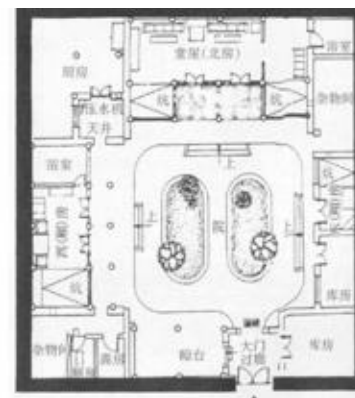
Gate of the Folk House-Zhuang Kuo Fig. 7. Floor Plan of the Folk House-Zhuang Kuo
